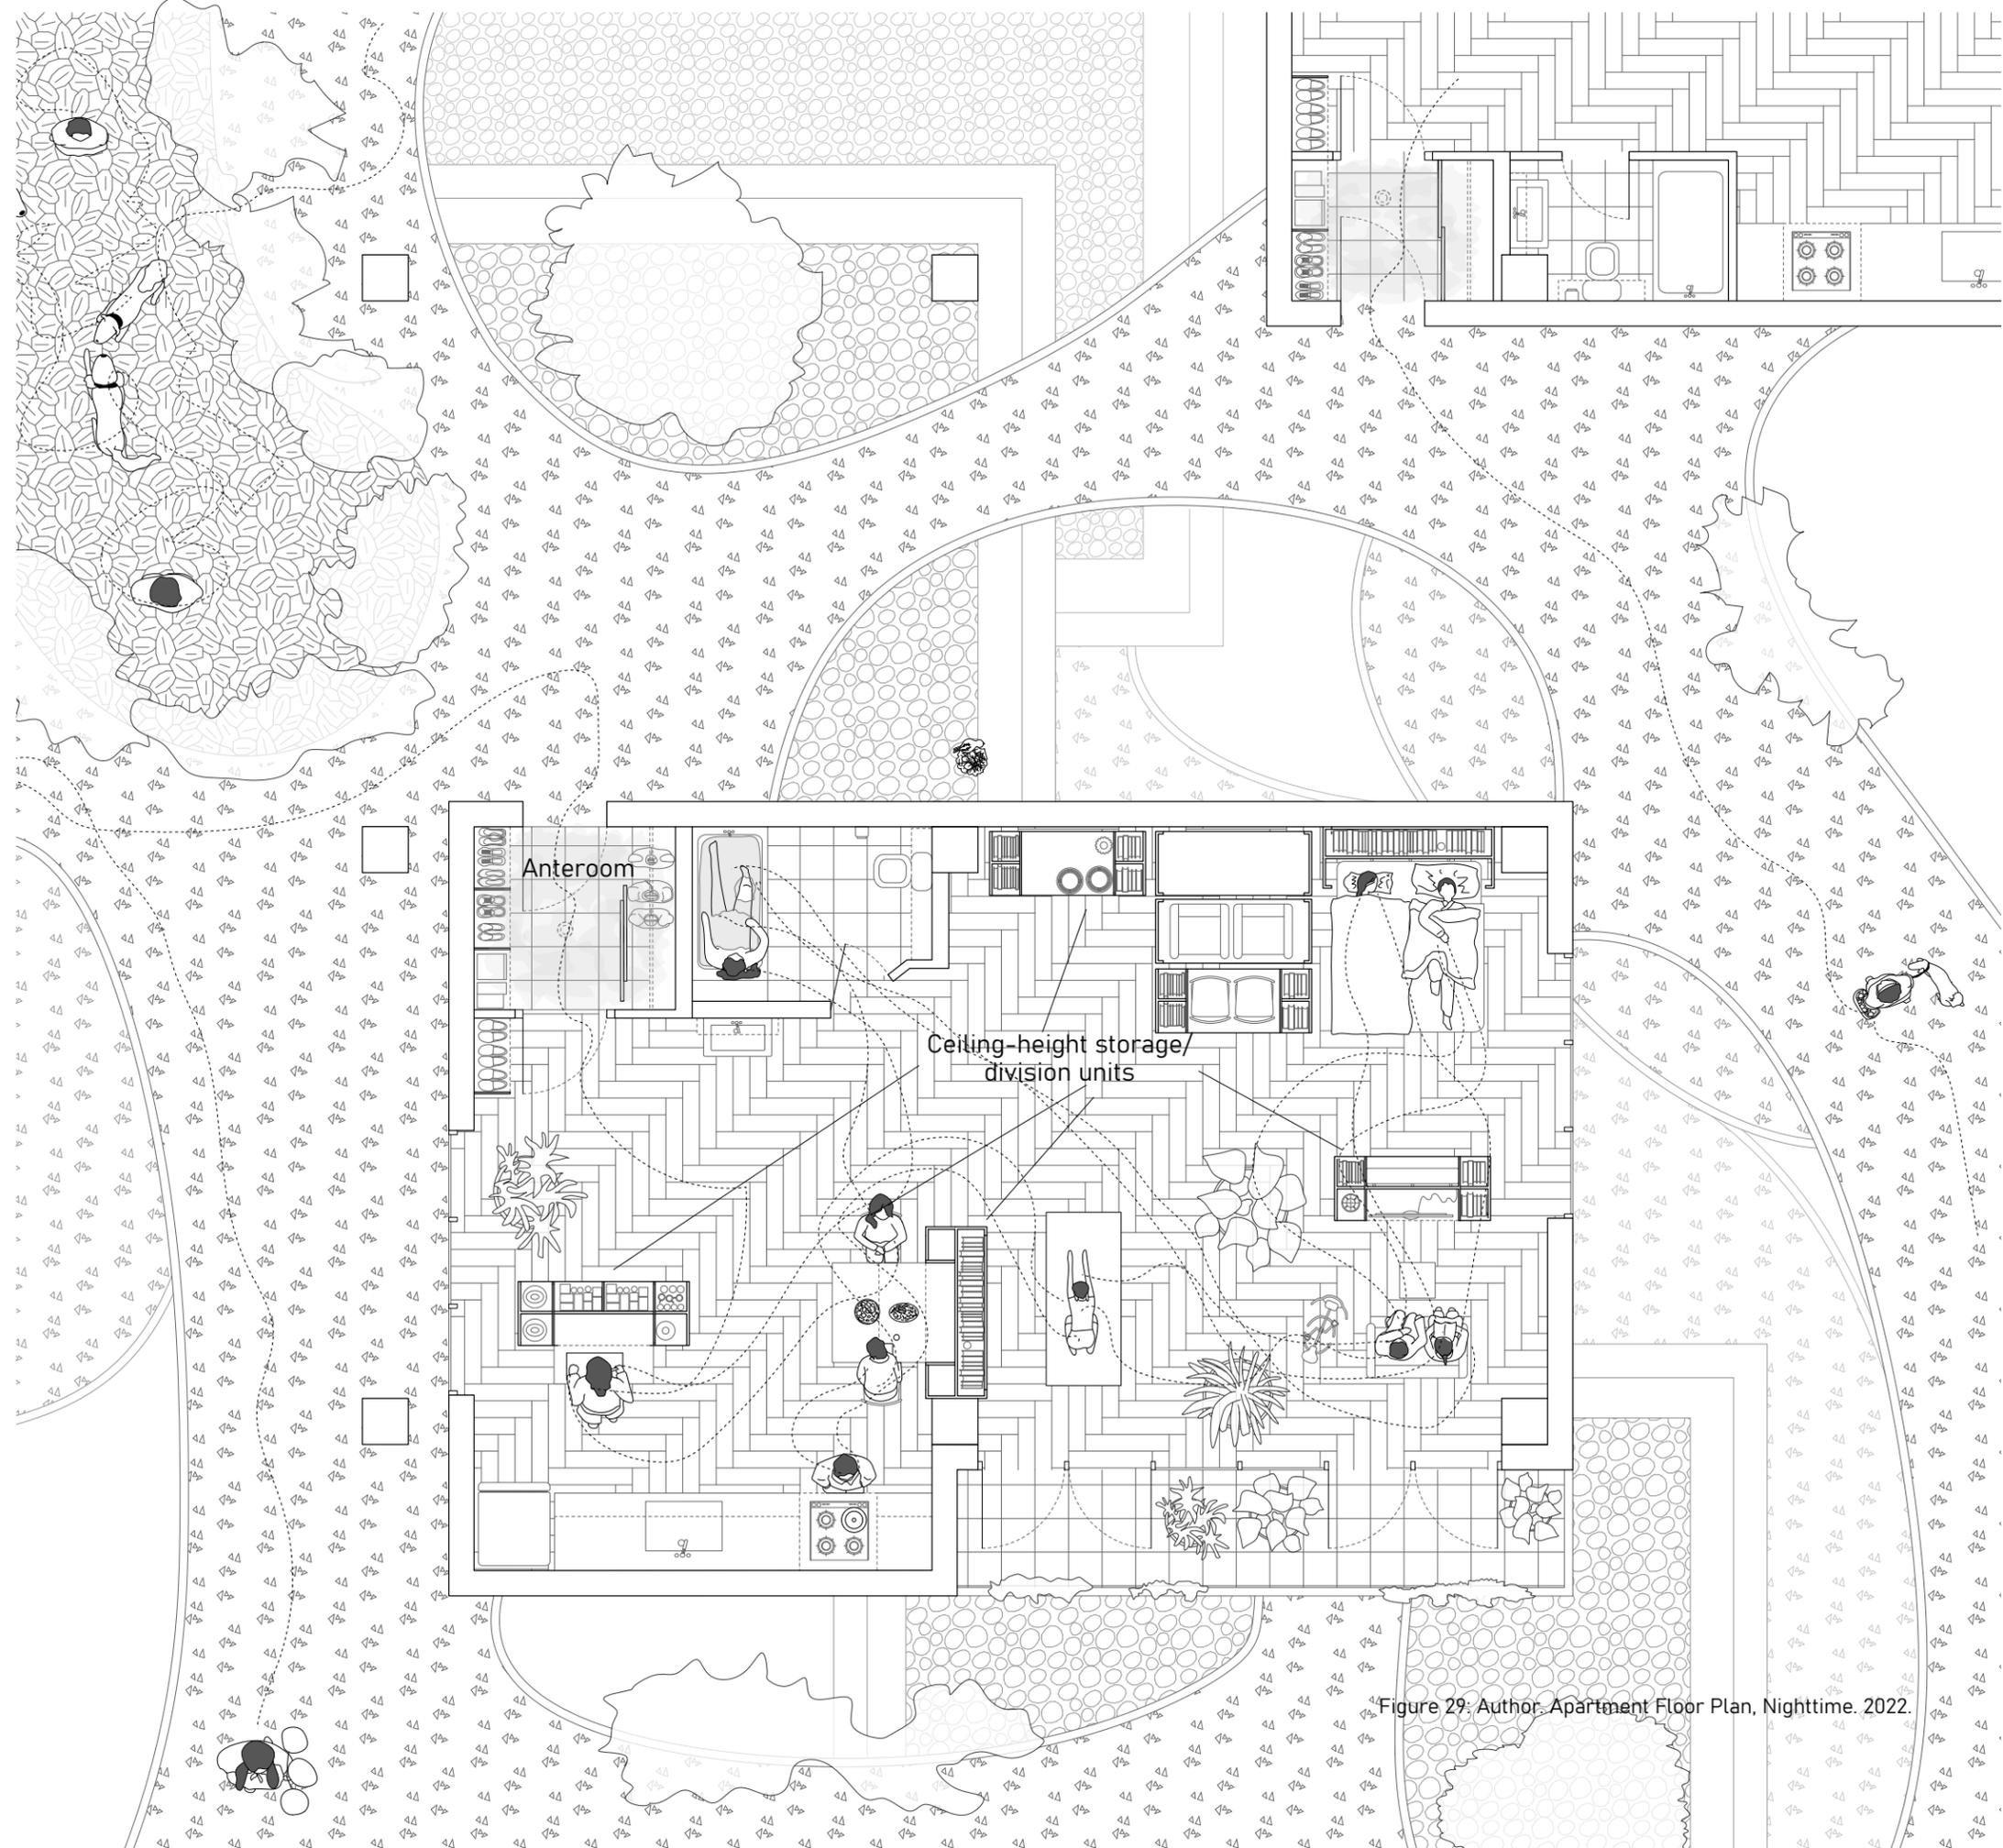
Author. Apartment Floor Plan, Nighttime, 2022.
